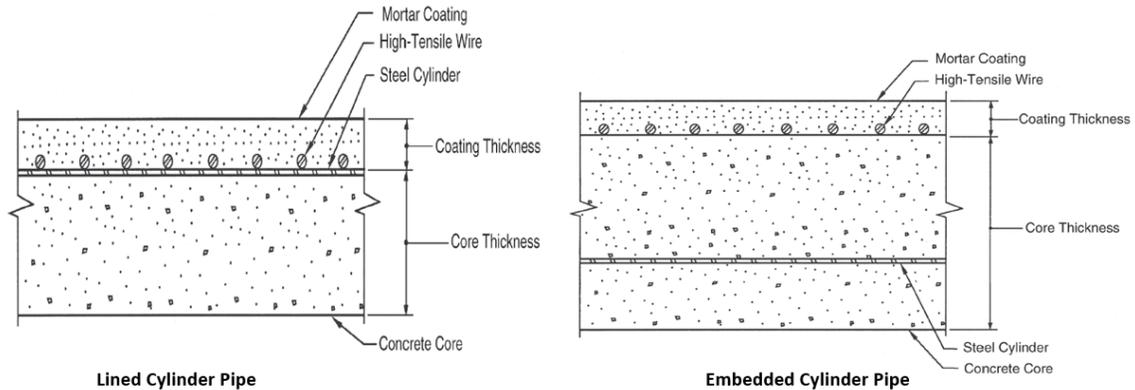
Schematic Shows the Different in Wall Cross Sections Between LCP and ECP Pipe (AWWA C304-14)
